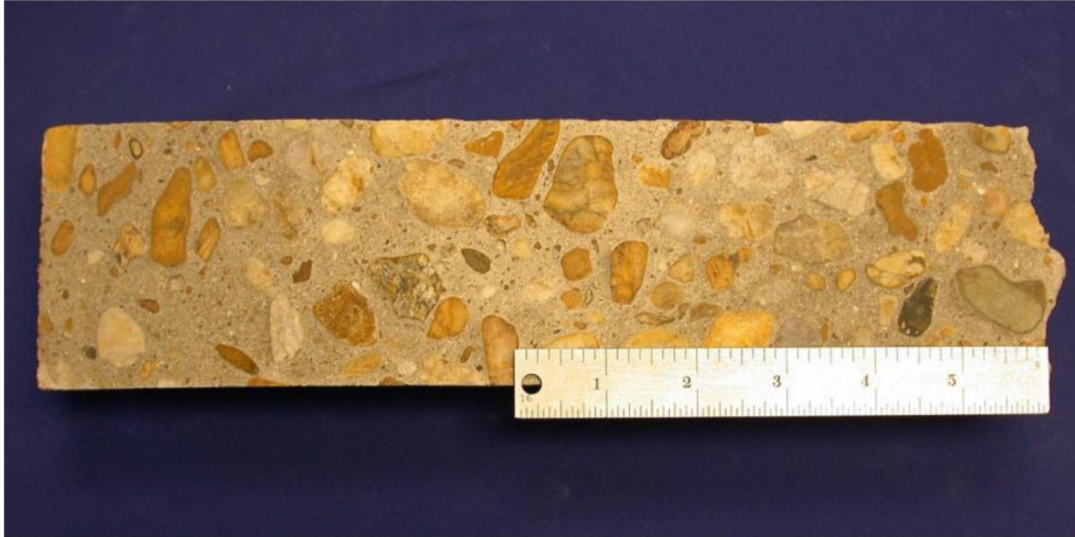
Lapped longitudinal cross section of Core 1B-N. Outside end of core is on left.
